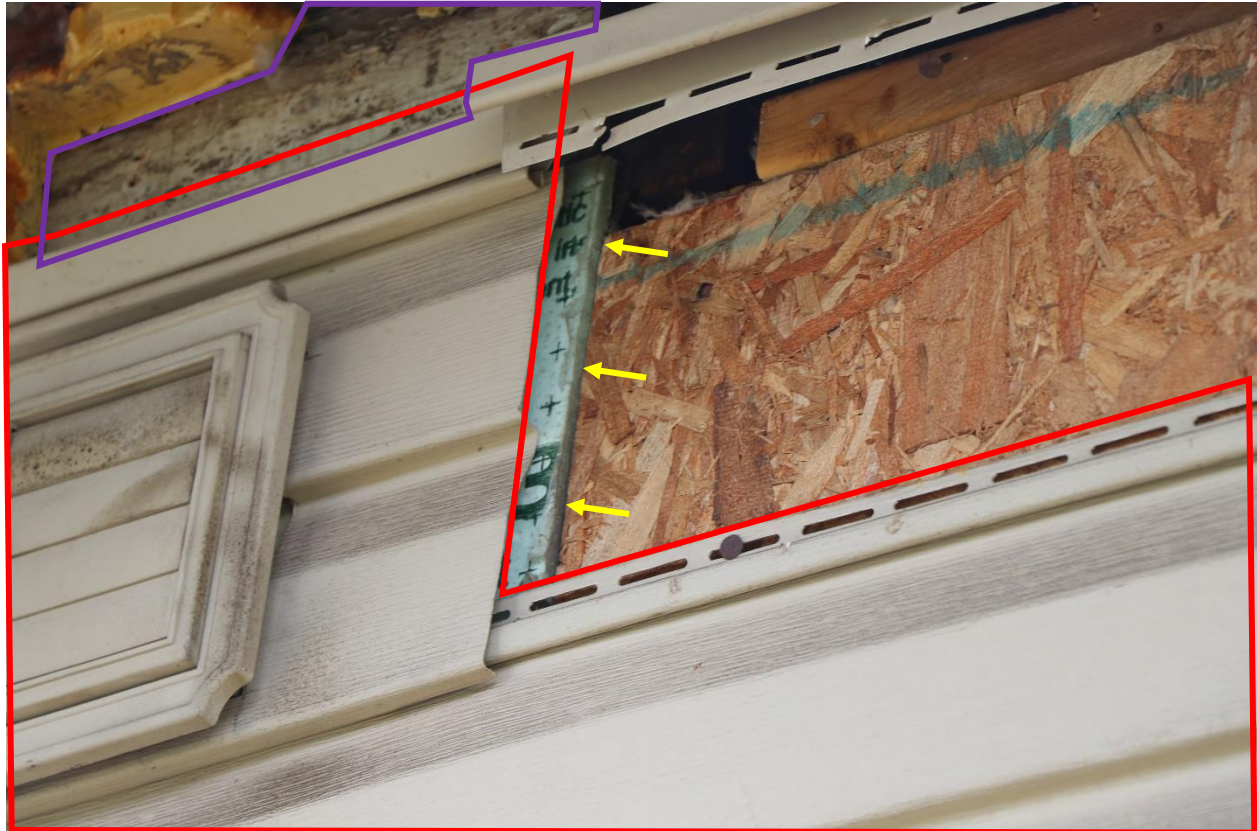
WJE observed vinyl siding (red box), insulation (yellow arrows), and vapor barrier (not visible), installed over white painted wood siding (purple box).
